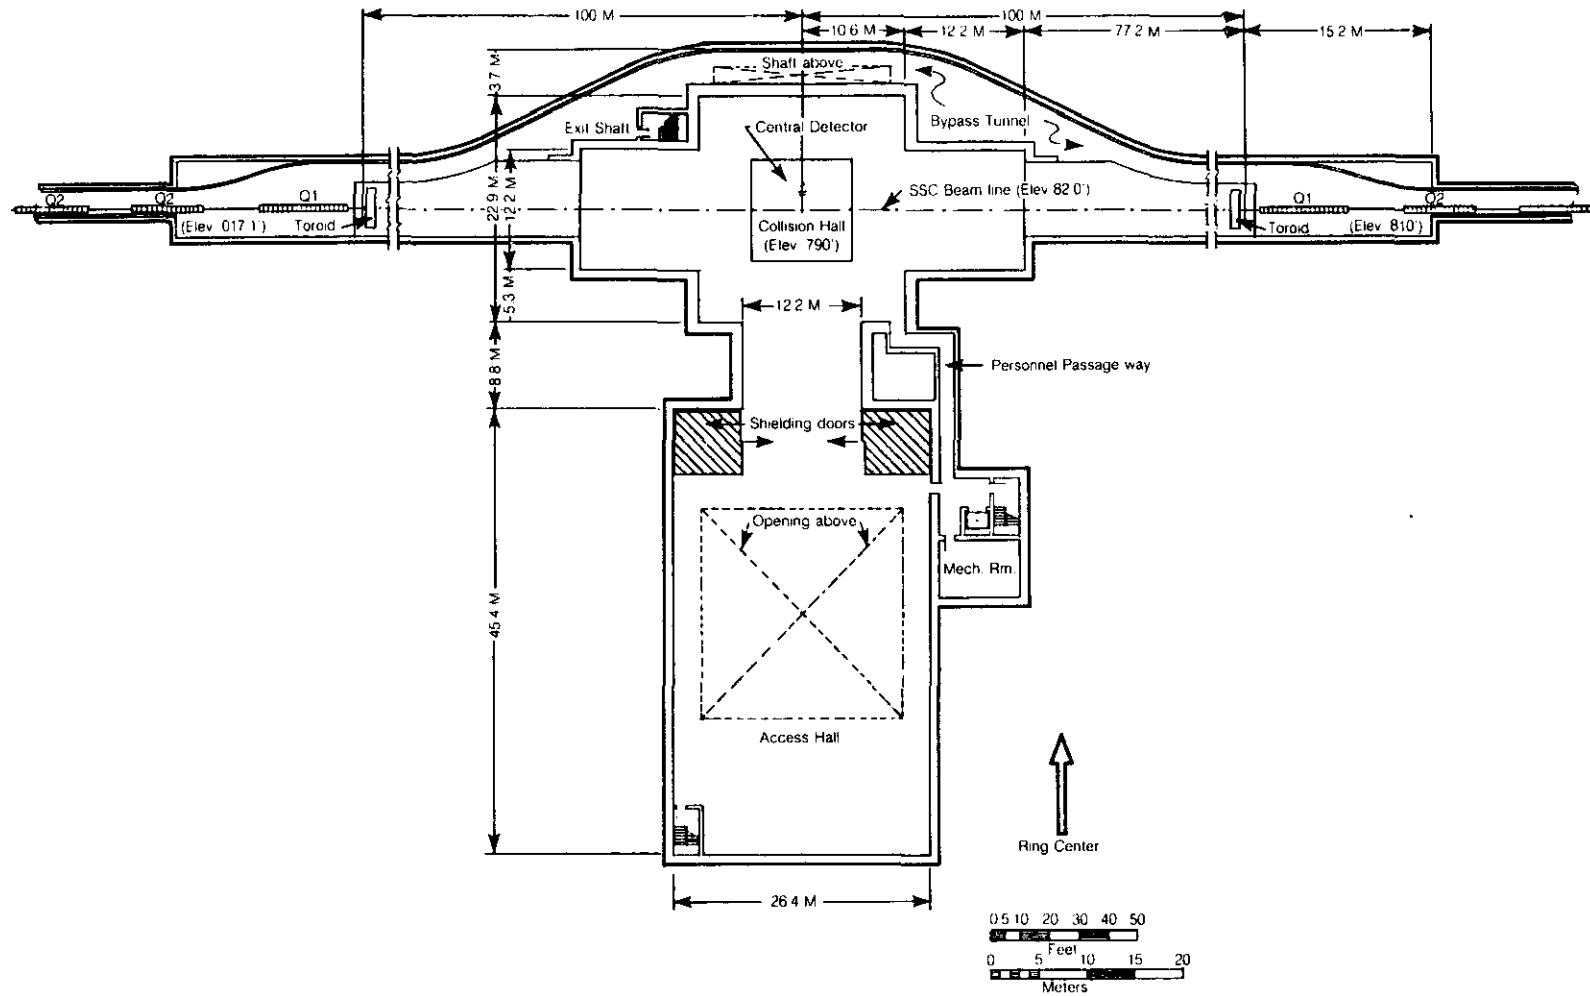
Plan View of Type B Interaction Region showing collision hall, access way, shield doors, assembly area and Staging Building.
